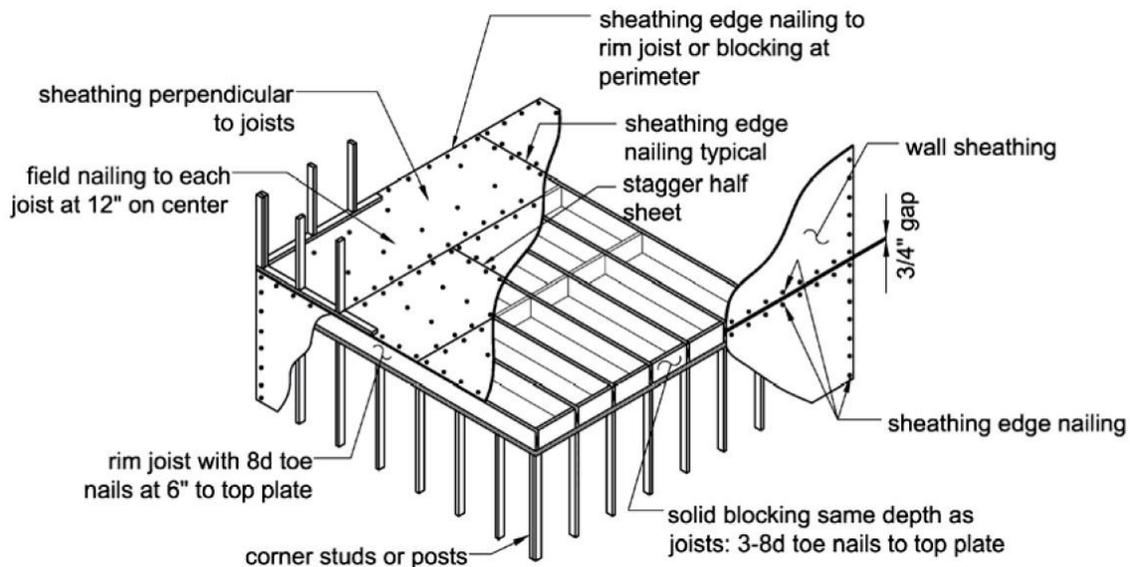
Blocked wood diaphragm example (credit: FEMA 232)
